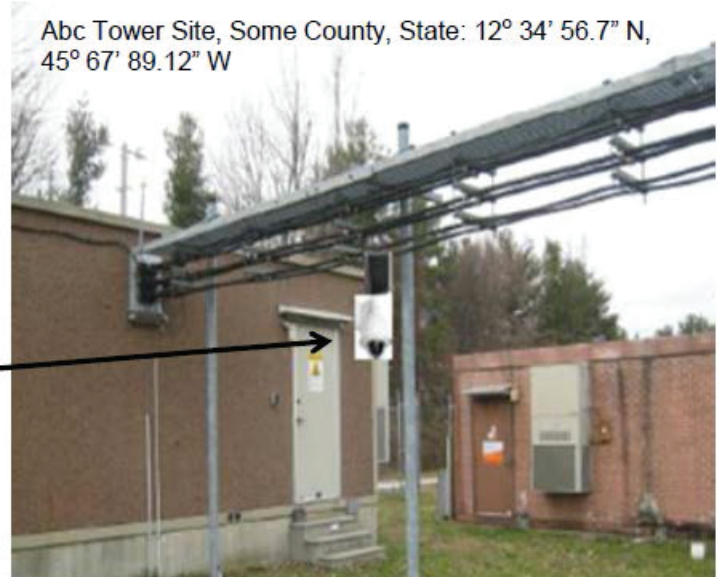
Ground-level photograph with graphic showing proposed equipment installation.
